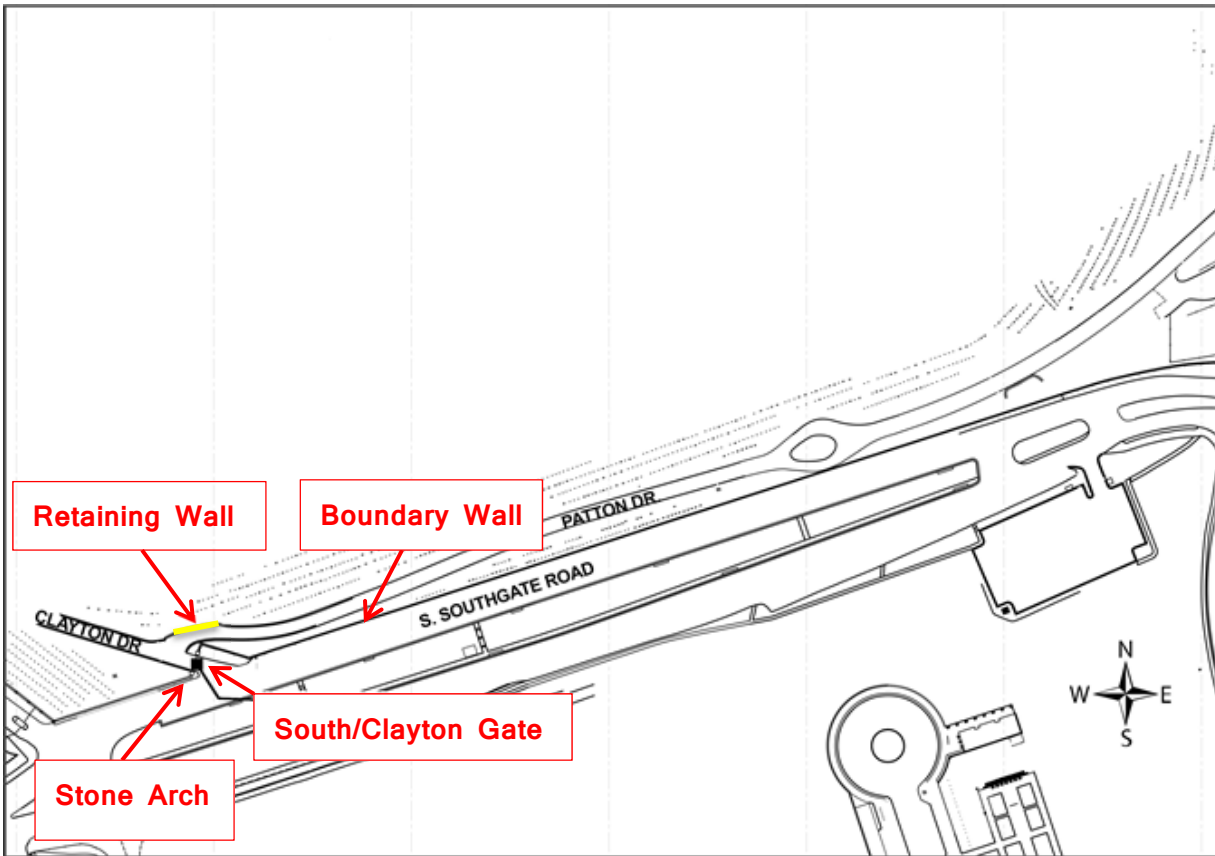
Location of Stone Arch, South/Clayton Gate and Retaining Wall
